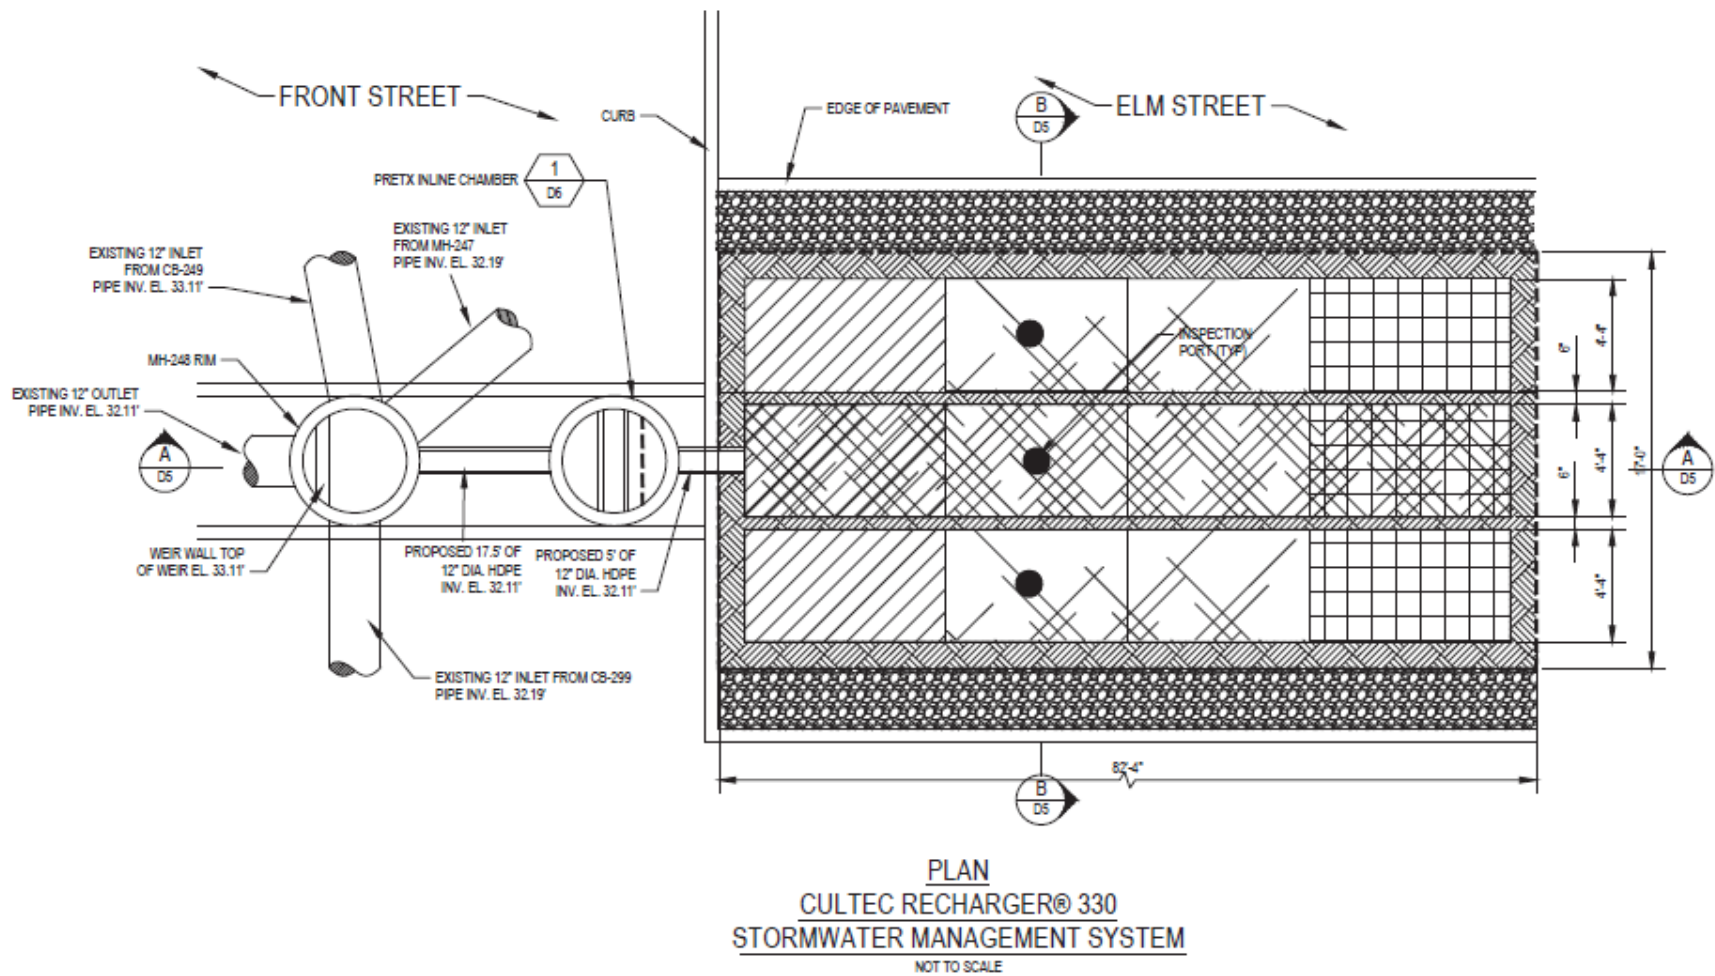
Engineering Layout Detail for Subsurface Infiltration System BMP 8
